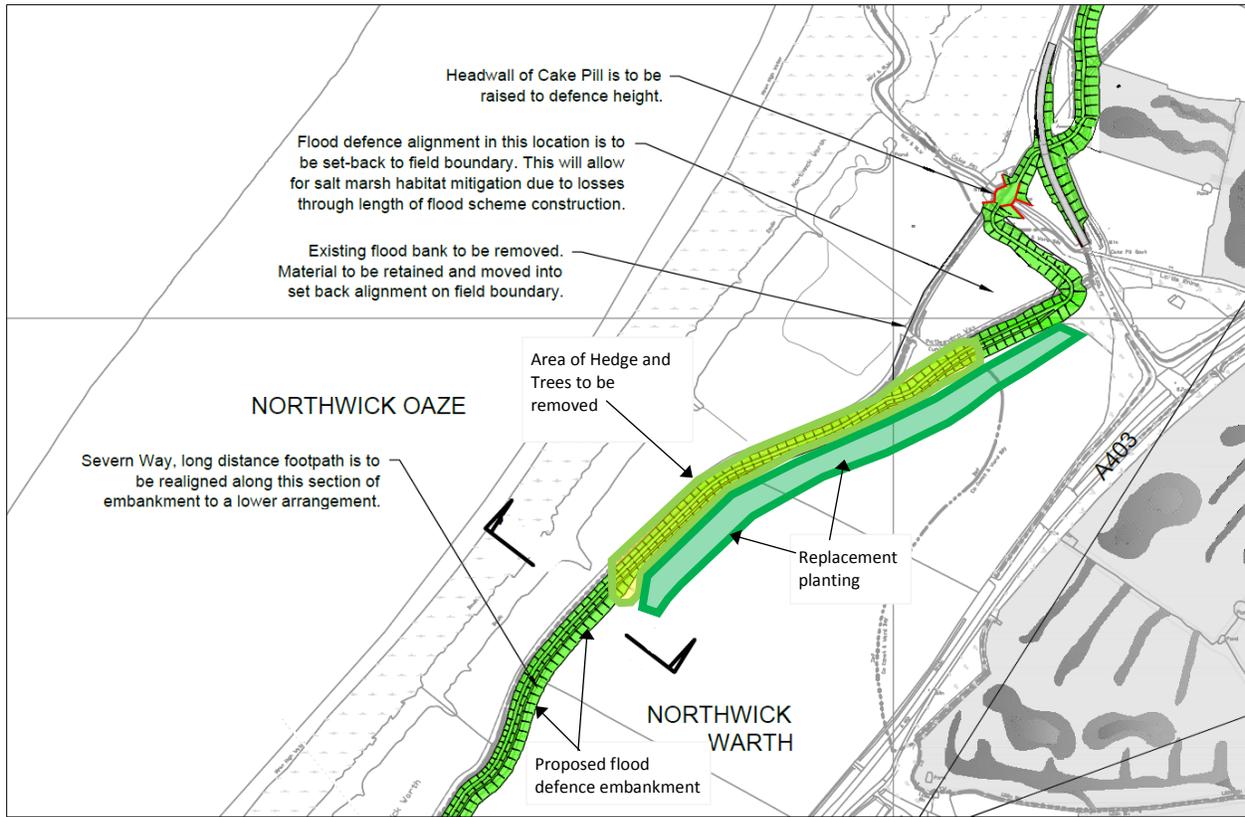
Plan of Currently Proposed Flood Defence Embankment
